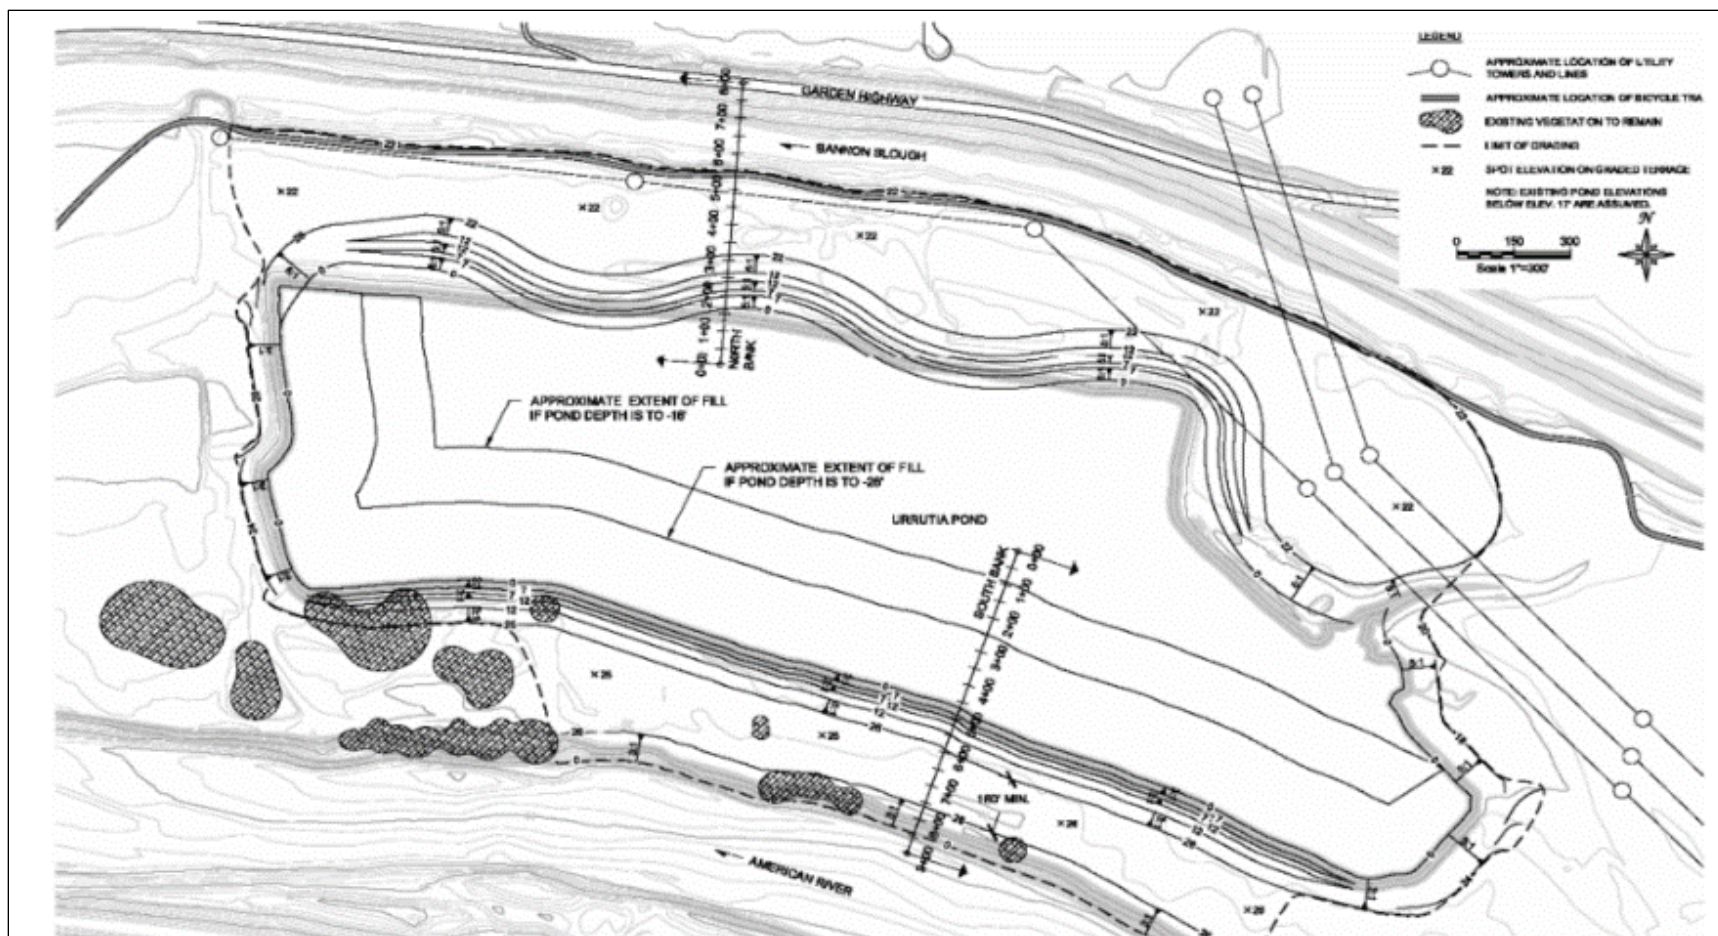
Sacramento County 2008 Urrutia Site Restoration Conceptual Plan
